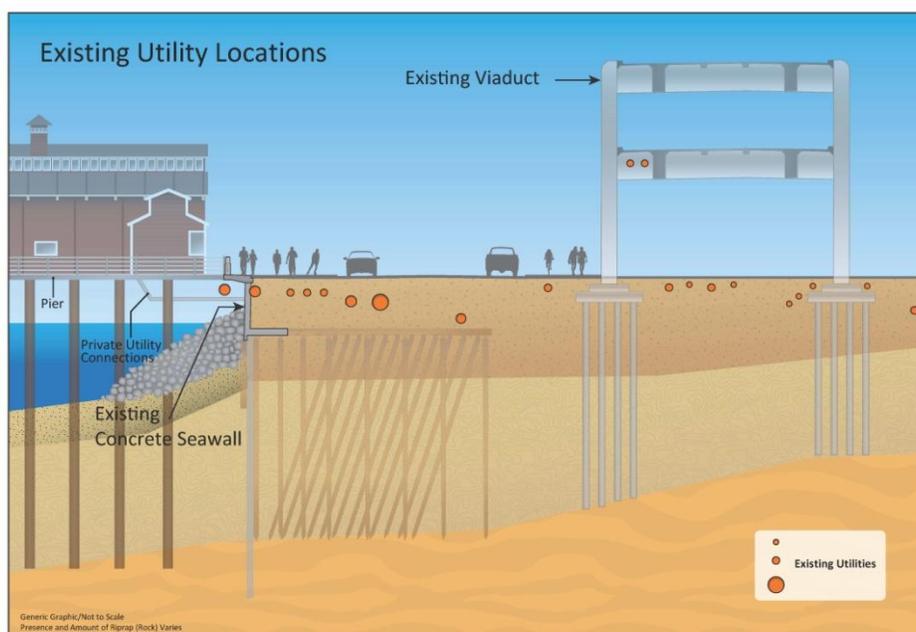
Representative Cross Section Showing Typical Existing Utility Locations within Project Limits
